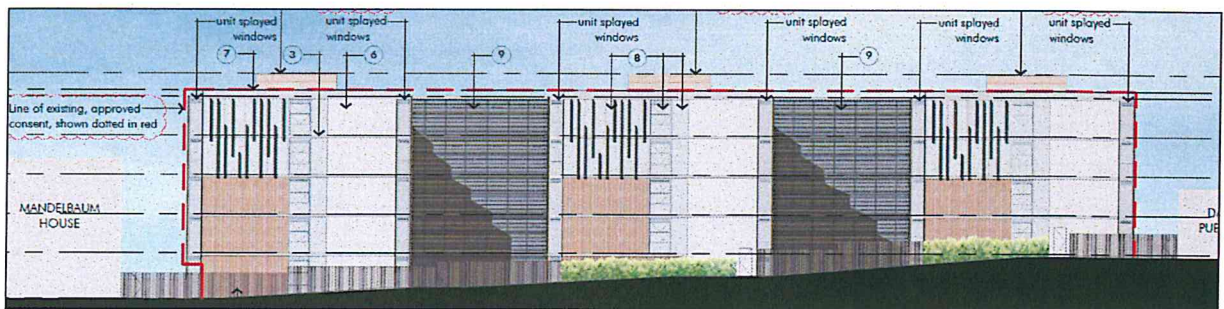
Proposed Northern Elevation (approved outline shown in red)
